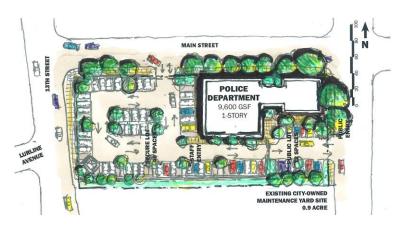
Facility Plan Detail: Police HQ at former Maint. Yard
